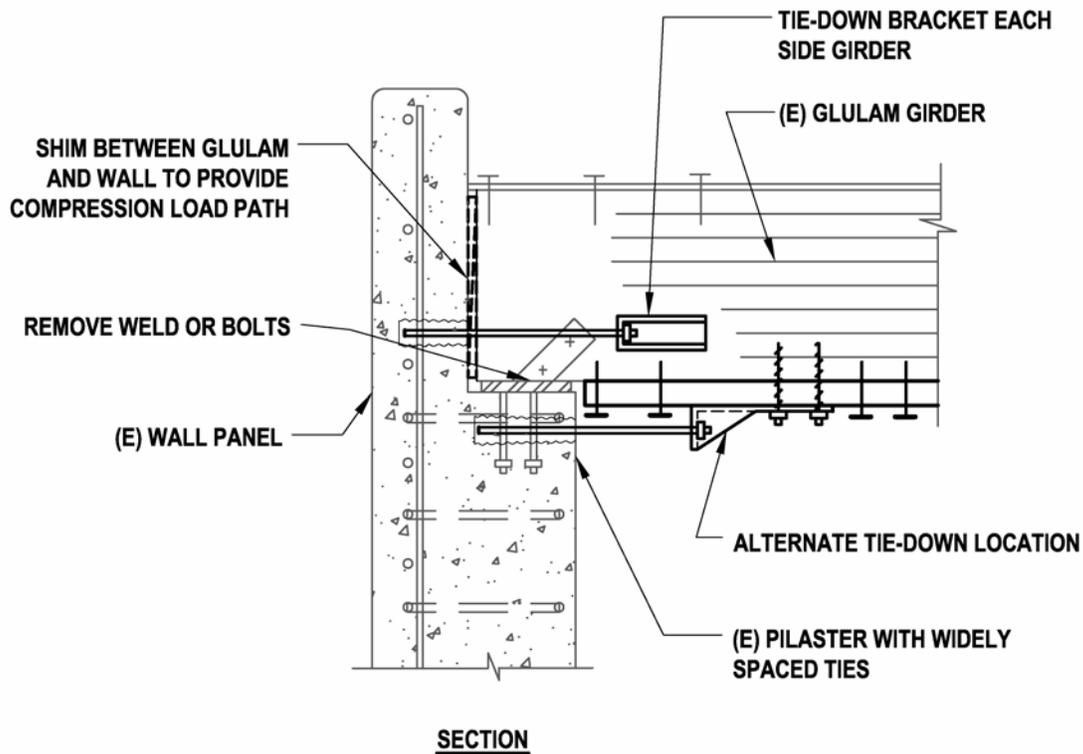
Enhanced Girder Connection at Pilaster
